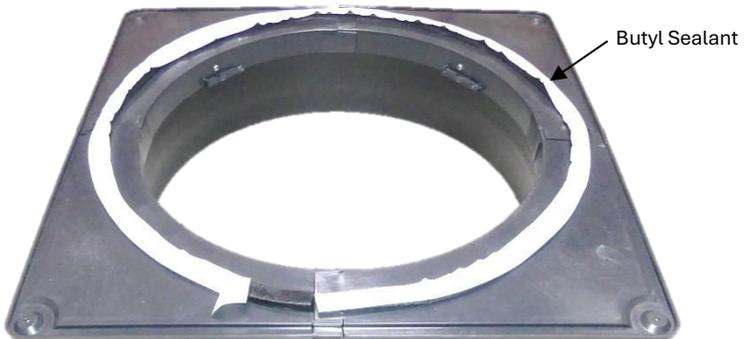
Butyl Sealant Install for 24 in. Circular Opening.
